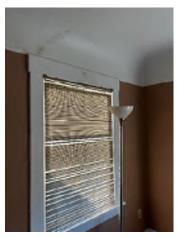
Sheetrock Cracks in the Ceiling and Walls.
